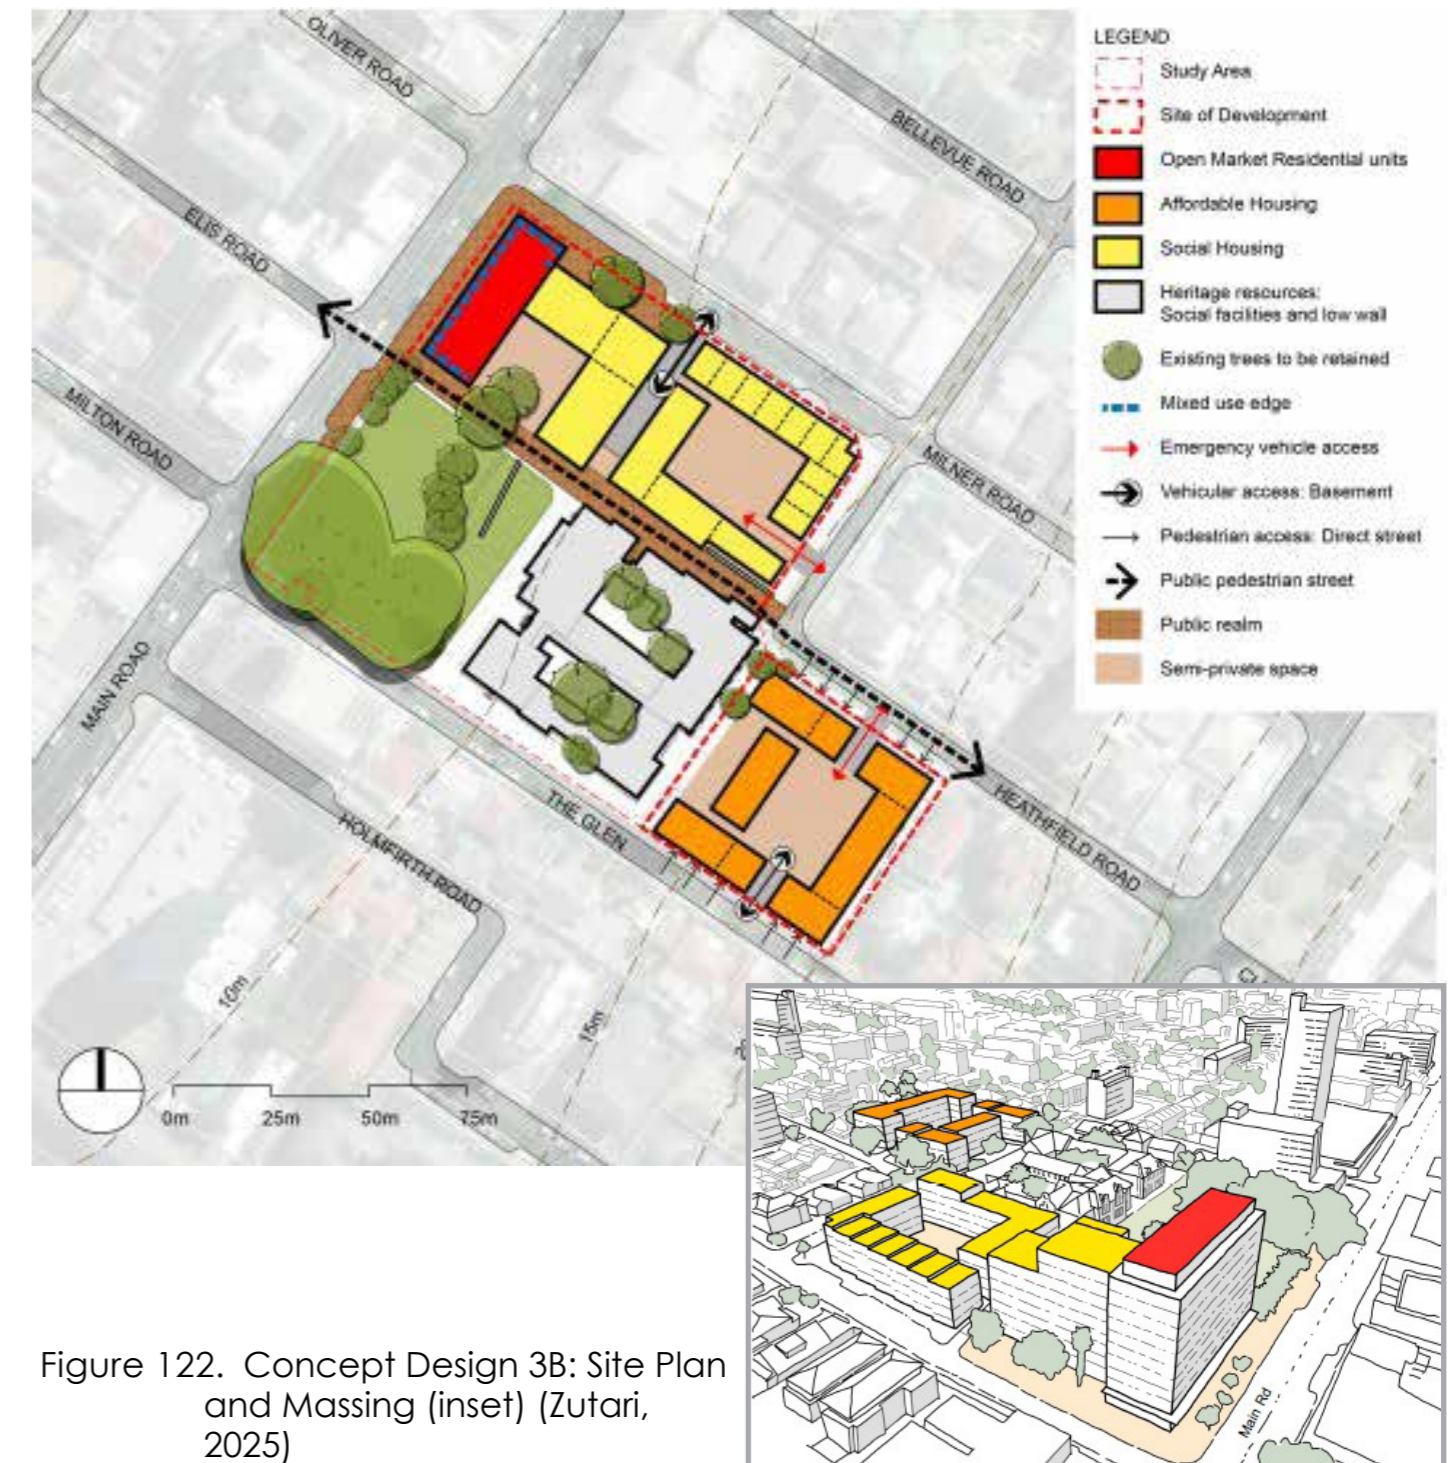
Concept Design 3B: Site Plan and Massing (inset) (Zutari, 2025)
